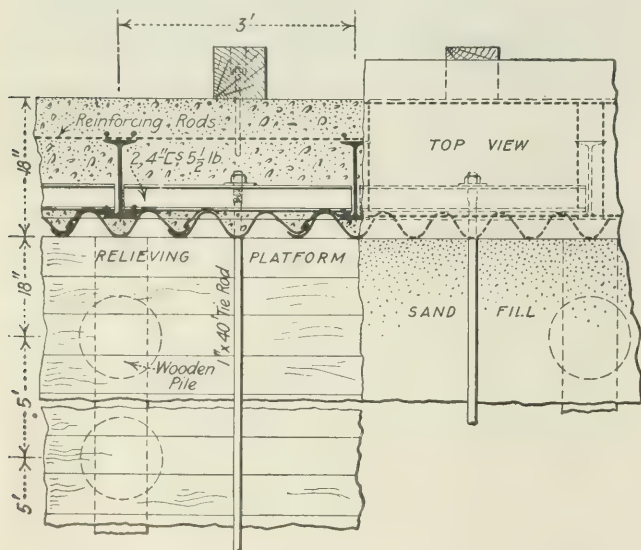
TYPICAL HORIZONTAL CROSS-SECTION OF BULKHEAD
